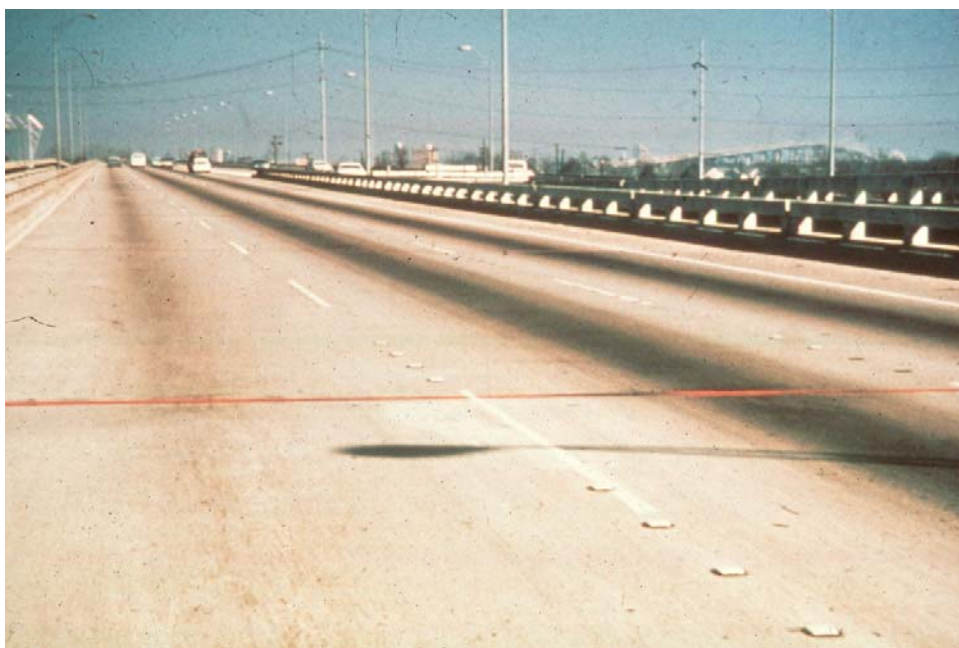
Bridge Deck with a Smooth Riding Surface
